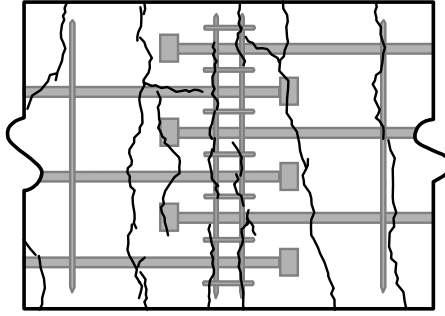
Internal cracking with hairpin confinement (specimen LS-08-04.04-12-10(N)-1-H0.6)
